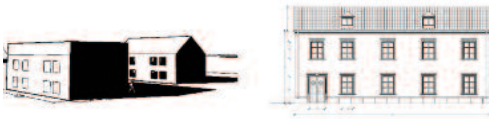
Typical building 4; its geometries and the medium sample building.
